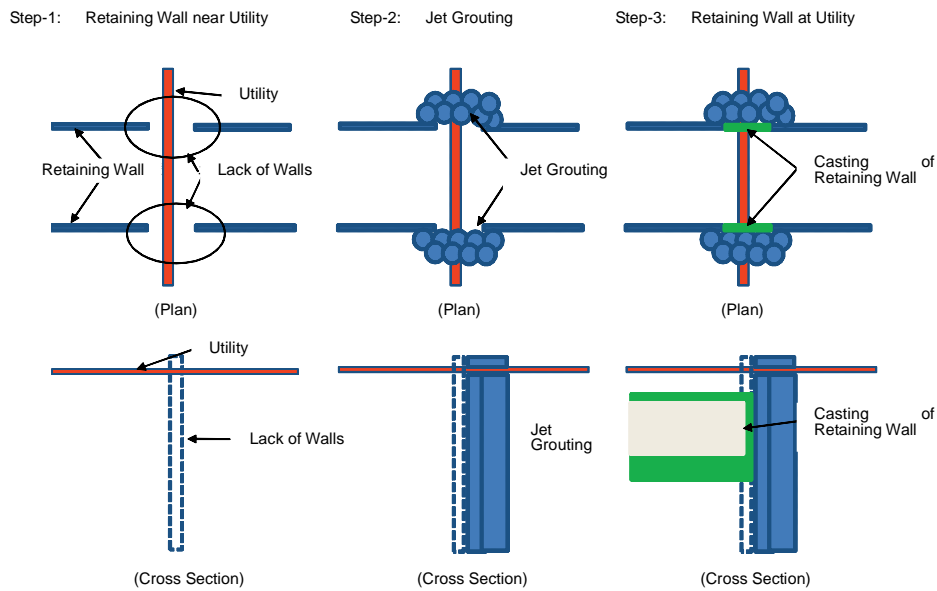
Temporary Hanging Method with Jet Grouting Reinforcement
